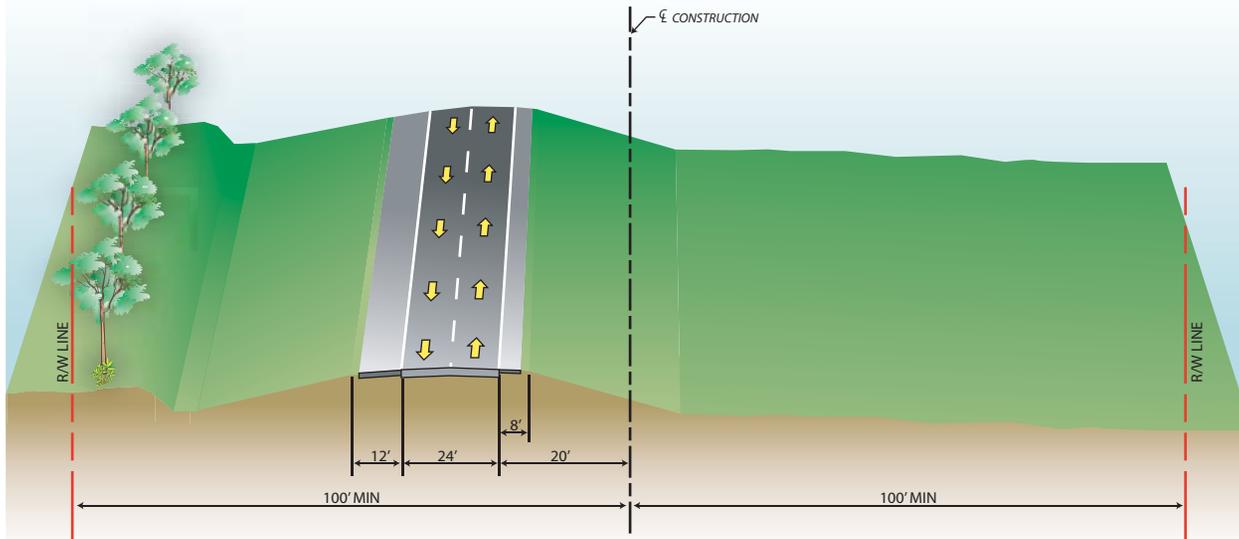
depicts the typical section for the CR 46A Realignment in Lake County East. The proposed roadway is a two-lane rural section expandable to four lanes. Initially, two 12-foot travel lanes will be built to one side of the 200-foot right-of-way centerline. The shoulders are 12 feet wide with five feet paved. For the four-lane typical section, the travel lanes are separated by a 40-foot grassed median. The inside shoulders are 8 feet wide, unpaved, and the outside shoulders are 12-feet wide with 5 feet paved. There is a minimum distance of 44 feet from the edge of travel to the right-of-way line.
